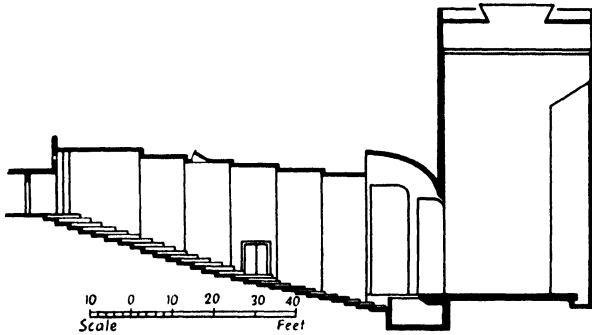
SECTION: ONE-STEPPED FLOOR FOR IDEAL SIGHT LINES
